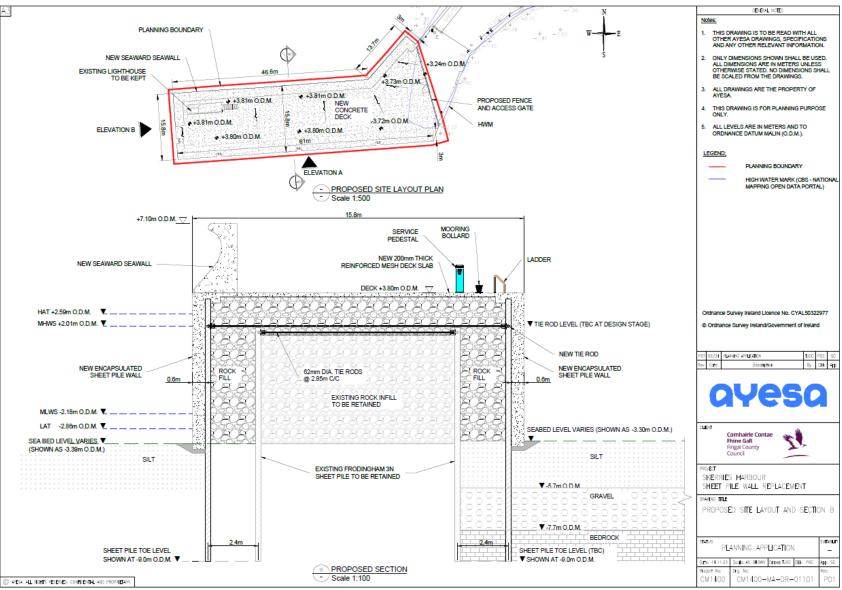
Plan and section drawing of proposed scheme (drawing provided by Ayesa).
